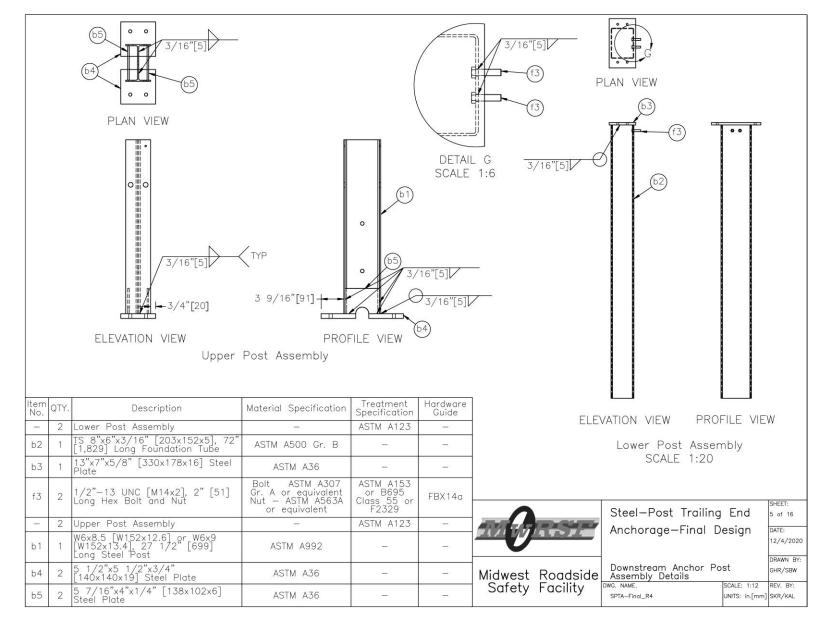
Steel-Post Trailing End Anchorage, Downstream Anchor Post Assembly Details
